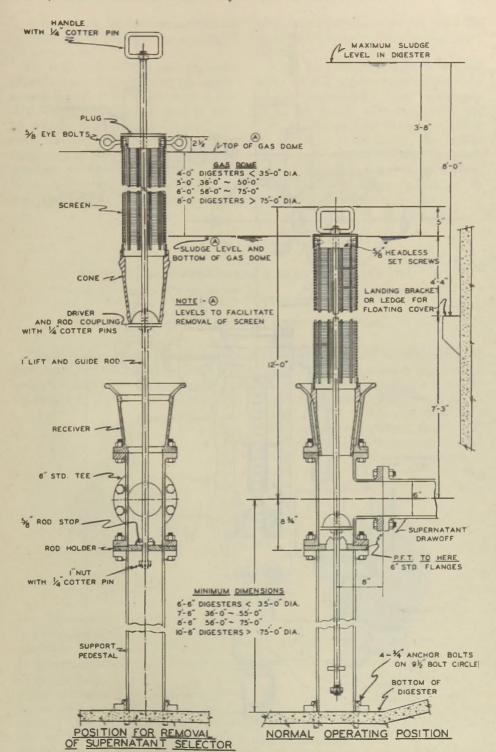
Details of removable type supernatant selector showing operating position and method of removal.
